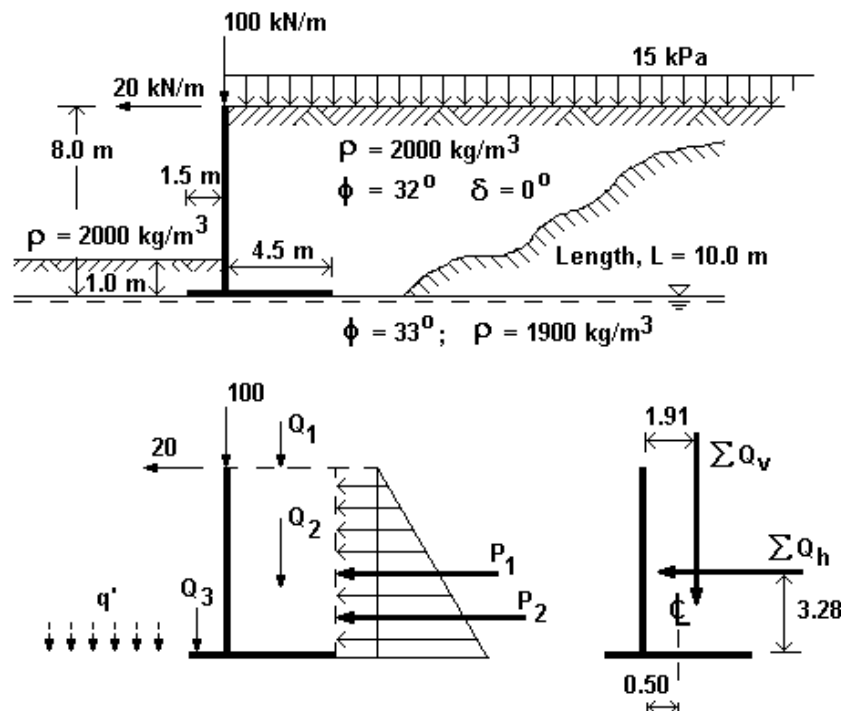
Cantilever wall example (Fellenius 1995)
